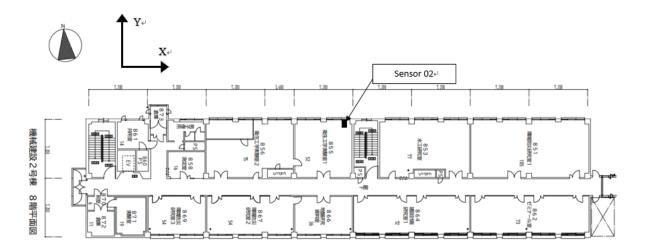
Location of sensor 02 installation on the 8th floor of the RC building
